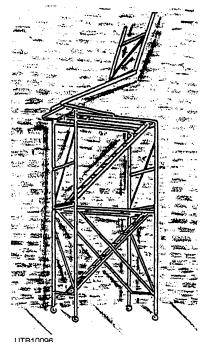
Folding sections with fixed platforms, guard rails, and built-in stairs.
